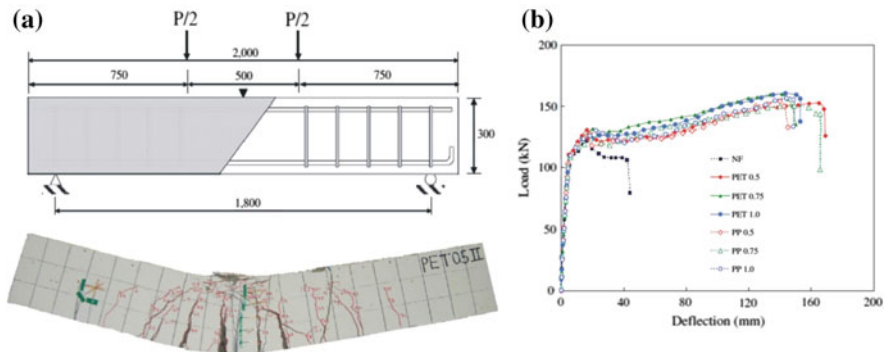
Concrete reinforced with fibres recycled from post-consumed PET bottles for improving the flexural behaviour of RC beams failing in bending: a reinforcement arrangement, loading and supporting conditions (dimensions in mm), b failure model and respective cracking pattern and c load versus midspan deflection (adapted from Kim et al. 2010)
